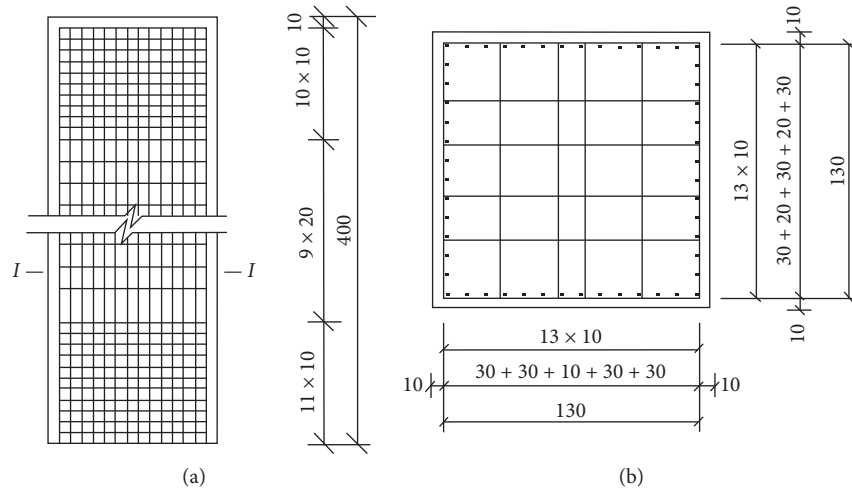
Dimensions of the pier (unit: cm): (a) sectional view and (b) cross-sectional view.
